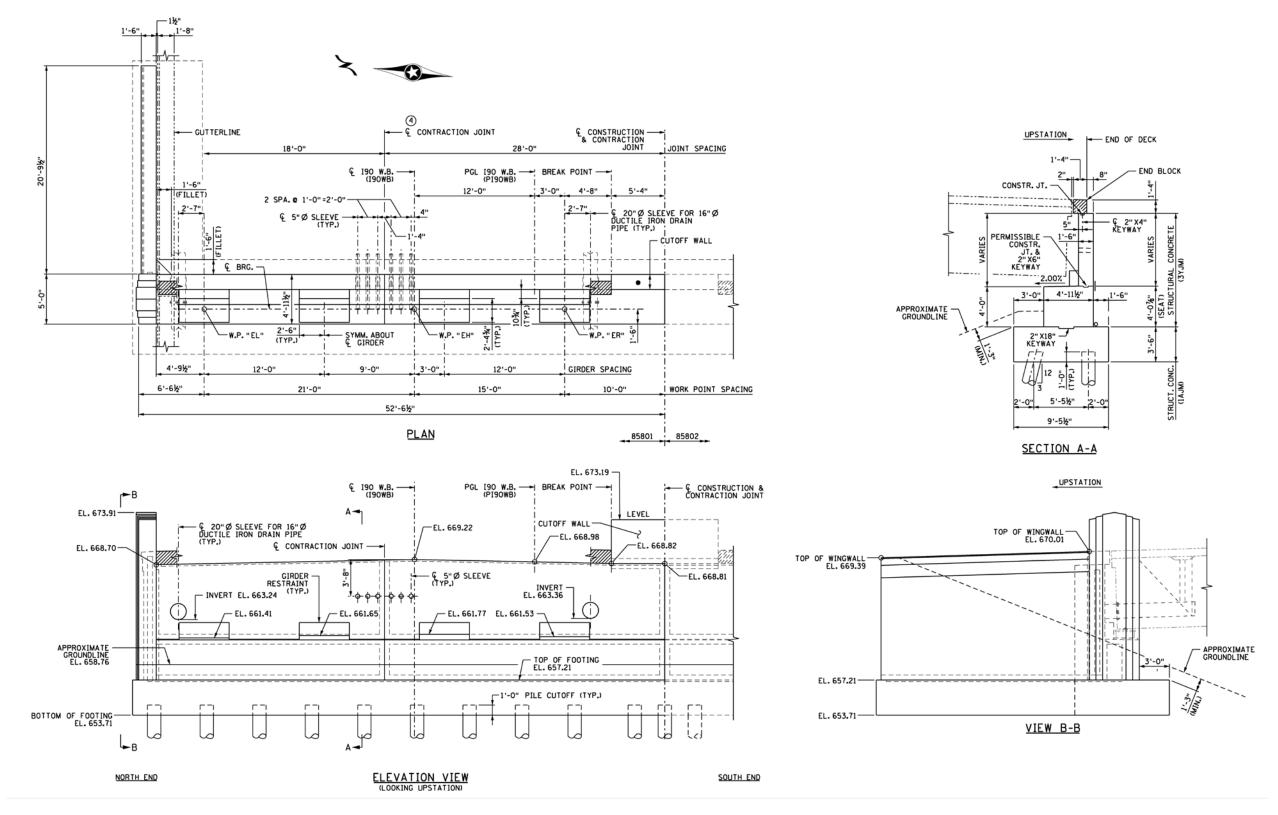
East Abutment Elevation, Section, and Plan View
